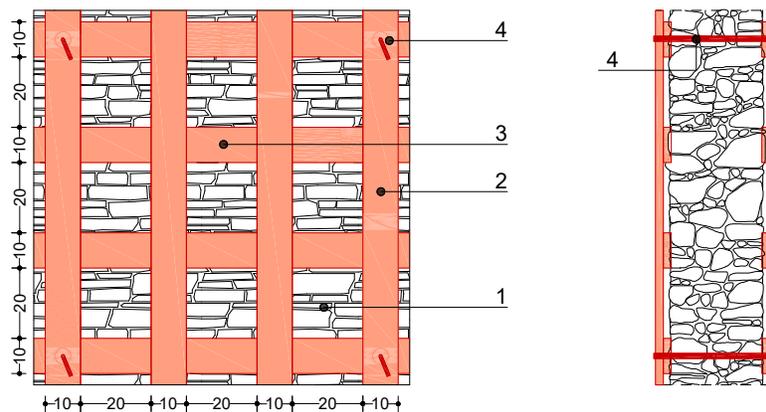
Retrofitting of masonry walls with CFRP strips (RS5): 1) existing masonry wall; 2) vertical CFRP strips; 3) horizontal CFRP strips, and 4) CFRP through-wall anchors.
